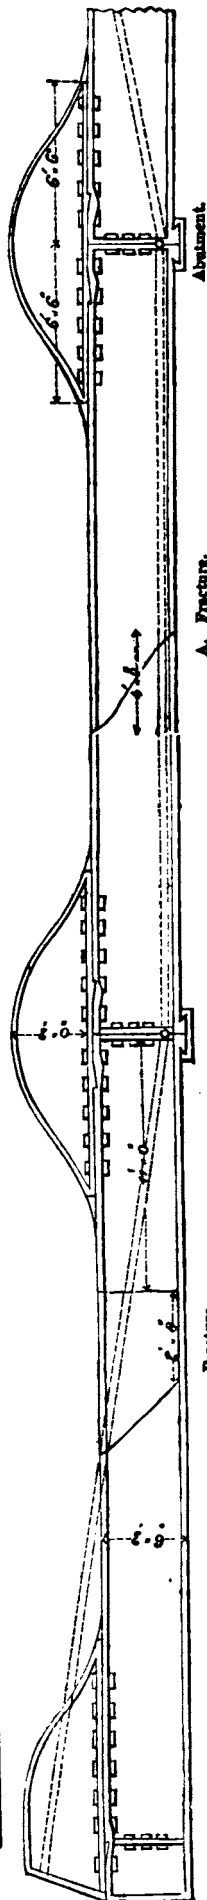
Elevation of Dee Bridge Girder 100 feet long and 98 feet in clear of the Bearings.
